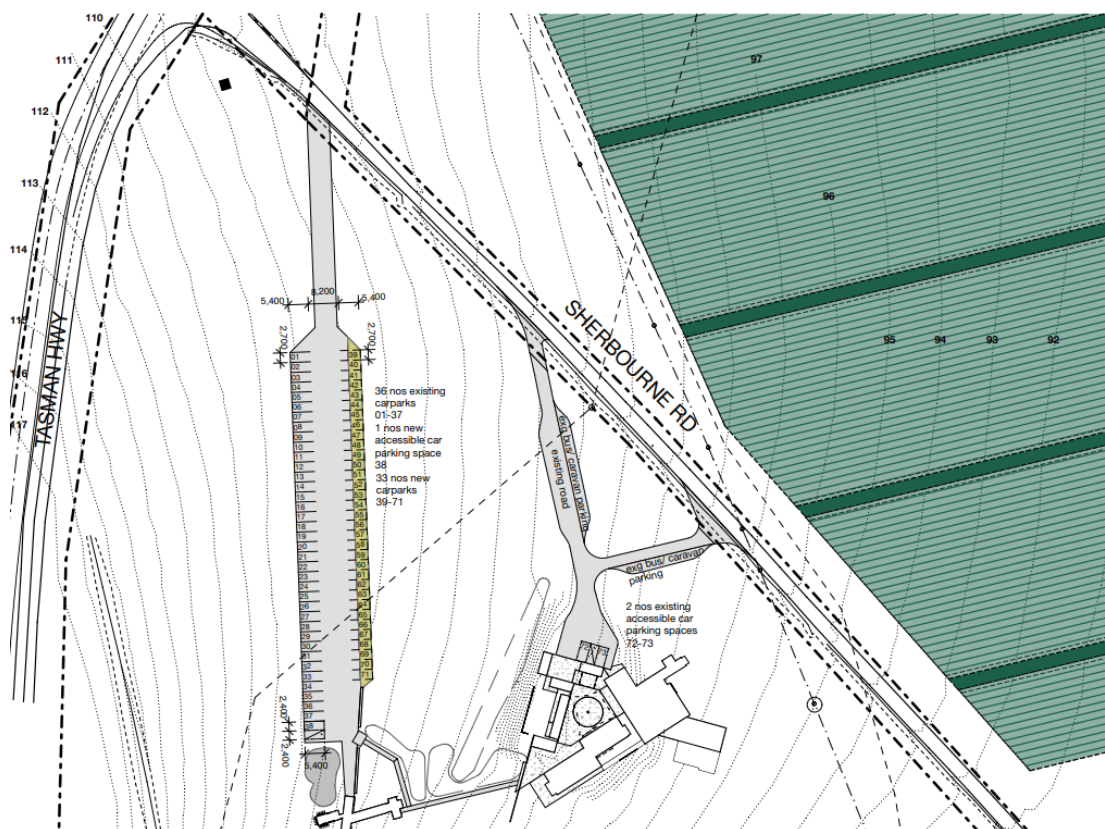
Parking Plan showing the three existing access points off Sherbourne Road (from the application documents).
